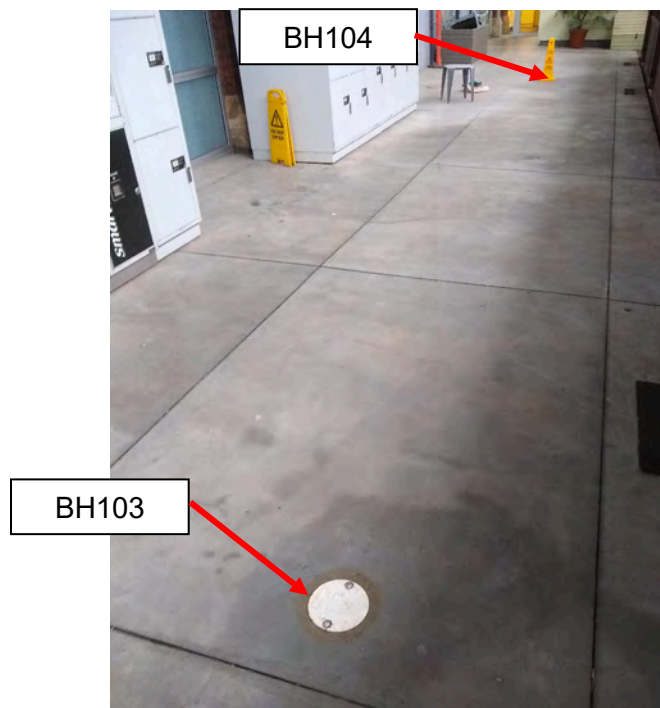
View north-east along a former rail platform, on the eastern side of the YHA building (Upper Ground Floor level). The locations of boreholes BH103 and BH104 (with white lid covers) are indicated as shown.
